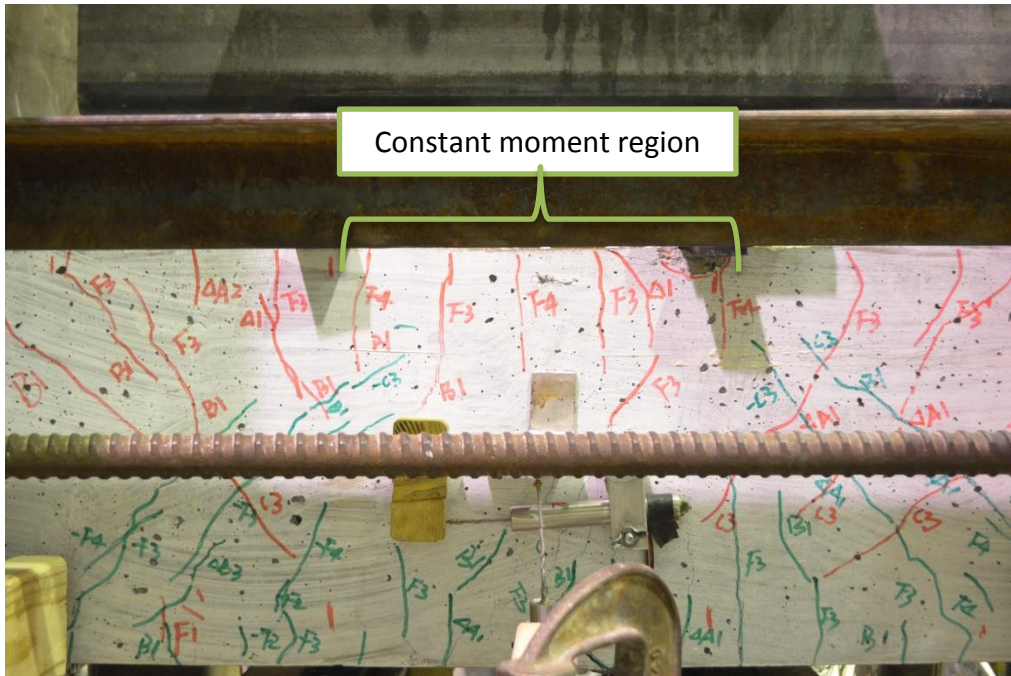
Crack Pattern of Specimen SS2-C at Ductility Three Prior to Failure
